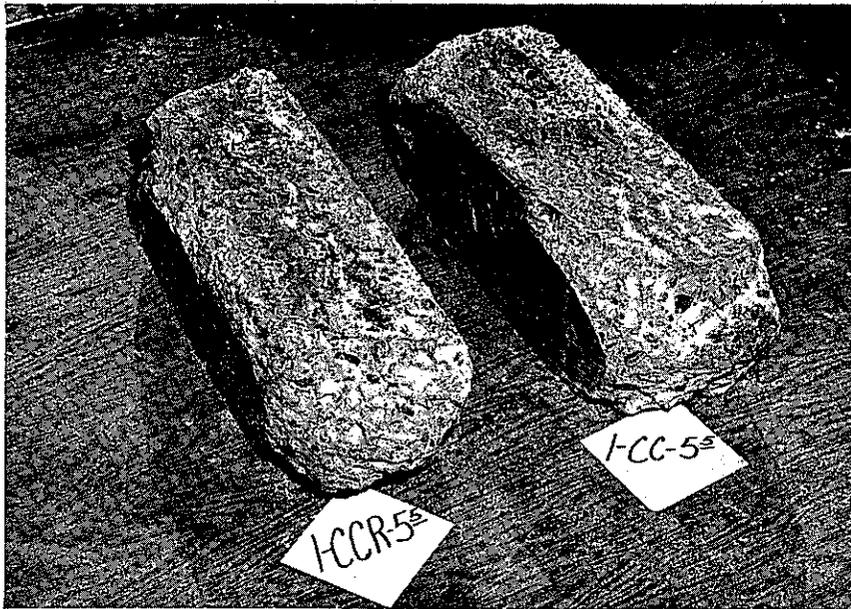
5-1/2-sack shrinkage compensated cement beams after 20 months sulfate exposure. Beam on left is internally reinforced.
